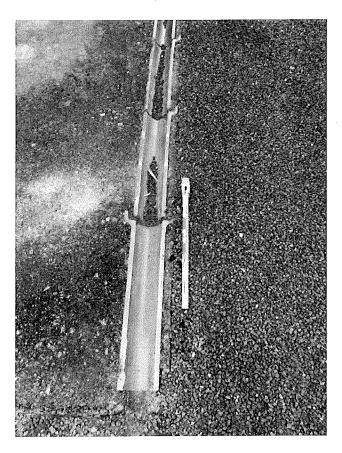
ACMA Facility main building ceramic drain pipes detail north east end.
